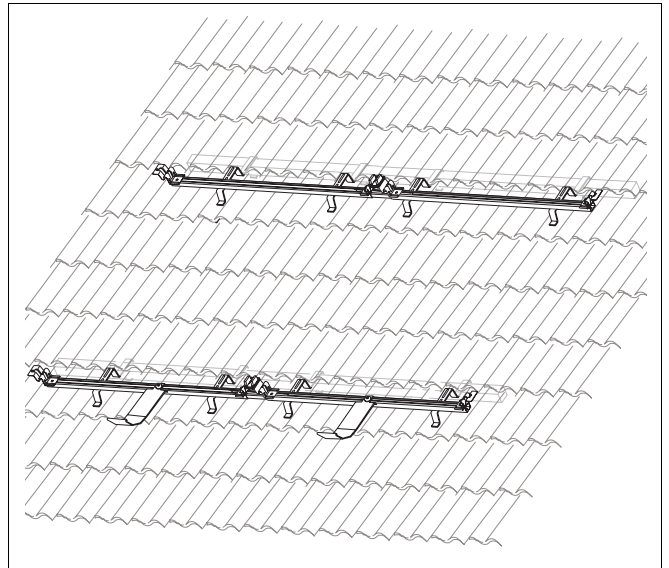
Profile rails with roof hooks installed on a tile roof – for two adjacent collectors
